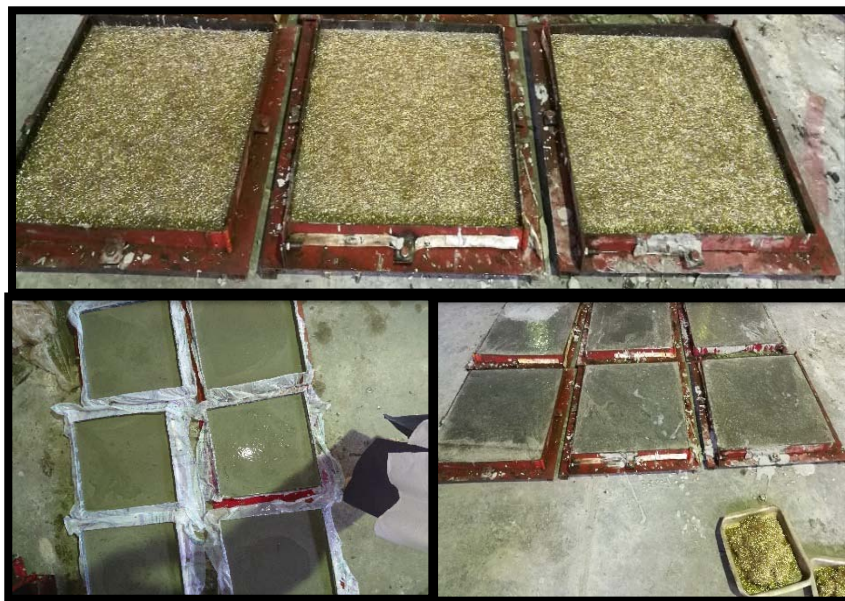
Impact resistance mold during casting. a) micro steel fiber pack, (b) during slurry cast, (c) after hardened specimens
